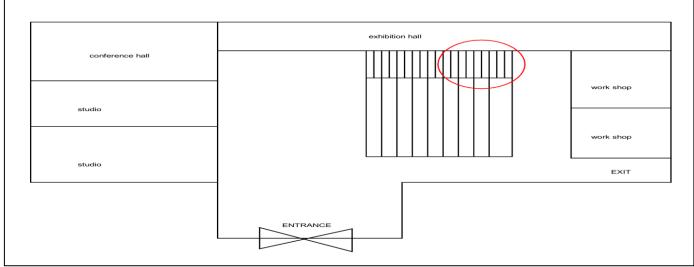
Sketch of the Ground Floor Plan of the MAD House
